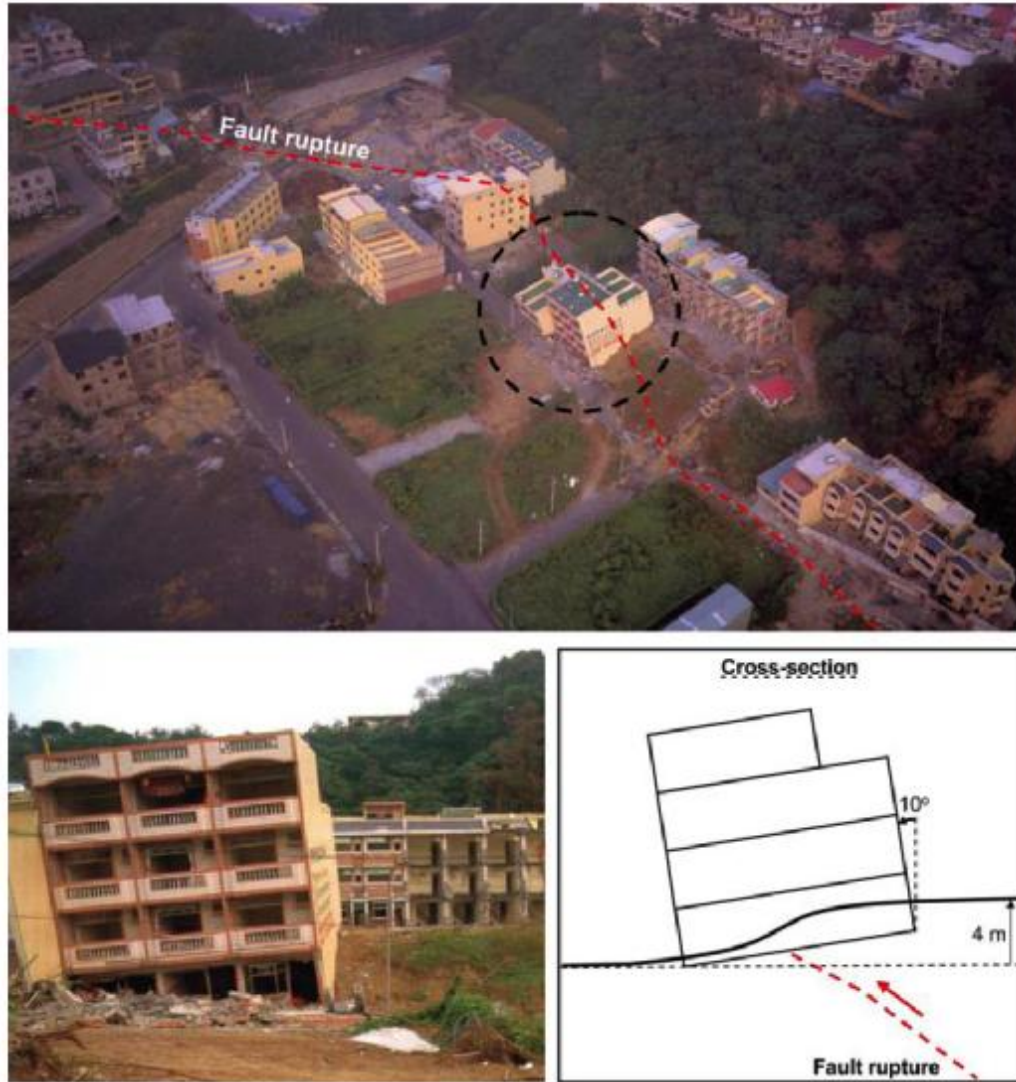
Chelungpu thrust fault, Chi-Chi, Taiwan 1999 earthquake—Chung-Cheng Park, Fung-Yan City: 4-story building resting on a continuous and rigid foundation (photos adapted from Hwang 2000). The building survived 4 m of upthrust without substantial structural damage, but subjected to approximately 10° of rigid-body rotation
